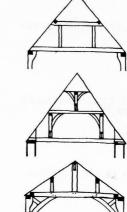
Ashlaring: Butt-Purlin Hammer-Beam Truss.
